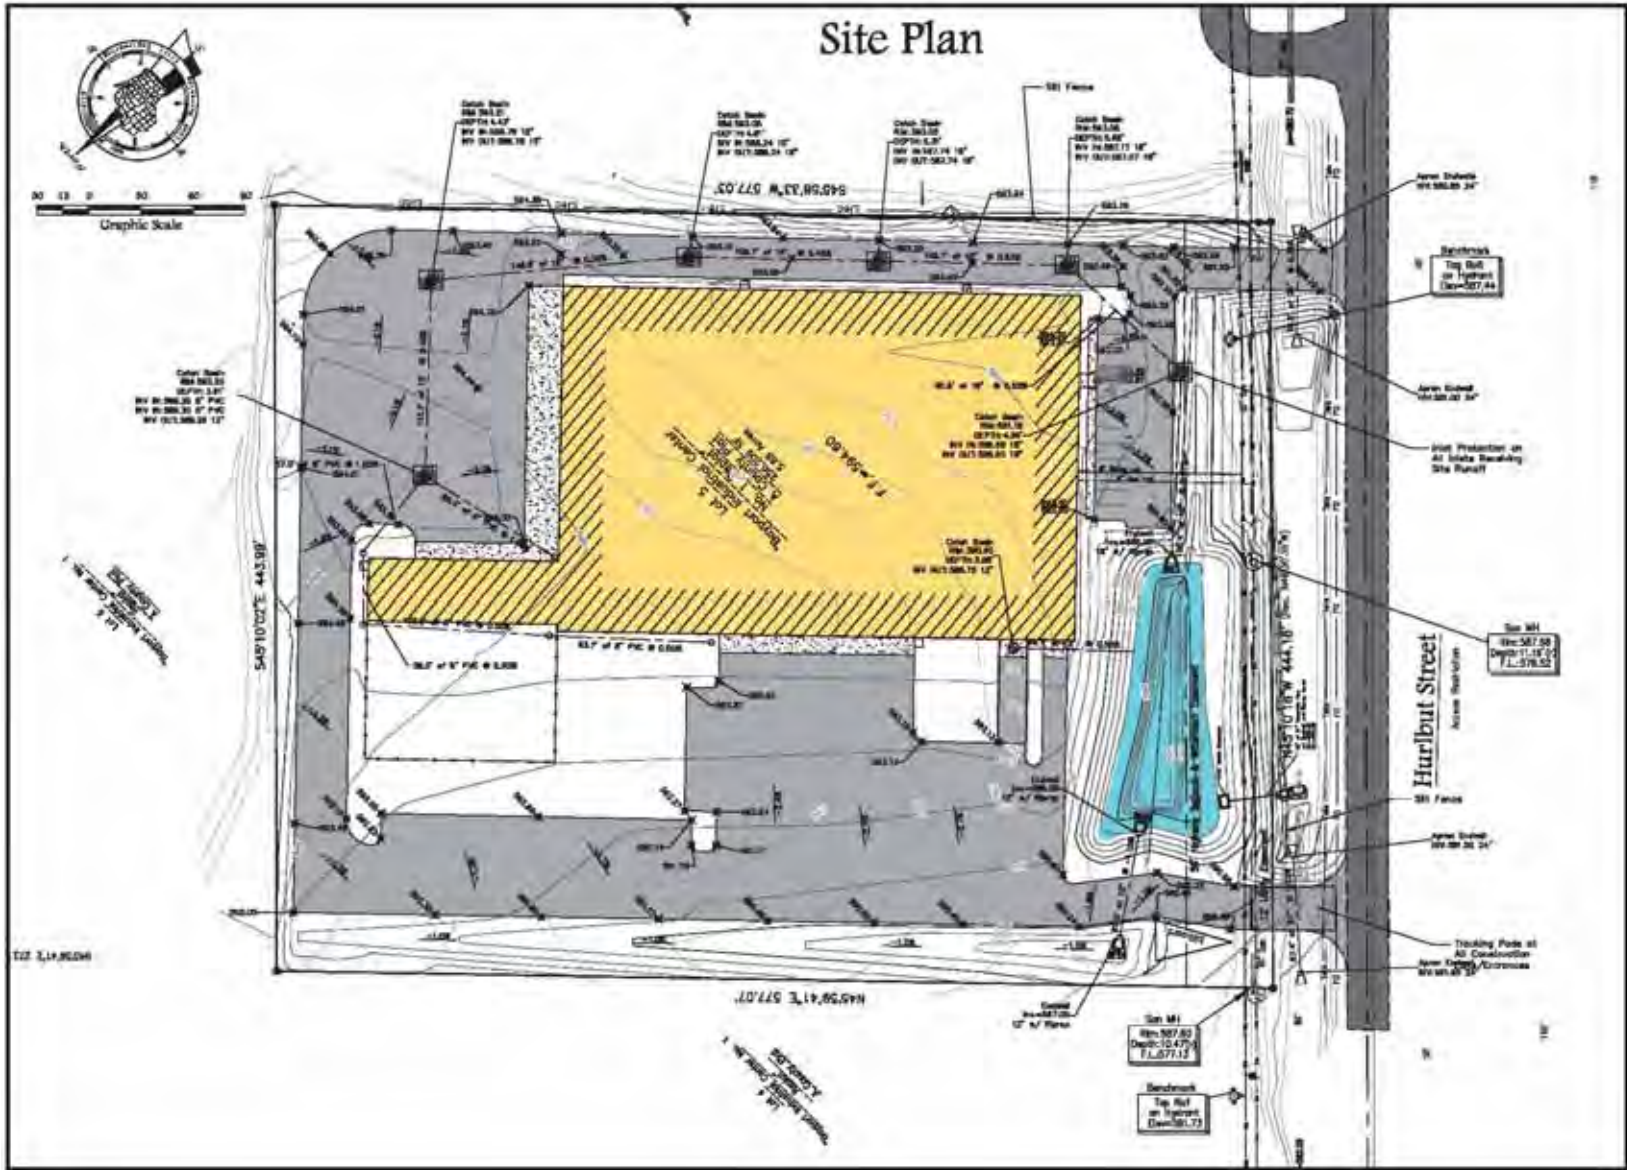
Preliminary Layout of Storm Water Retention Pond and Site Drainage
